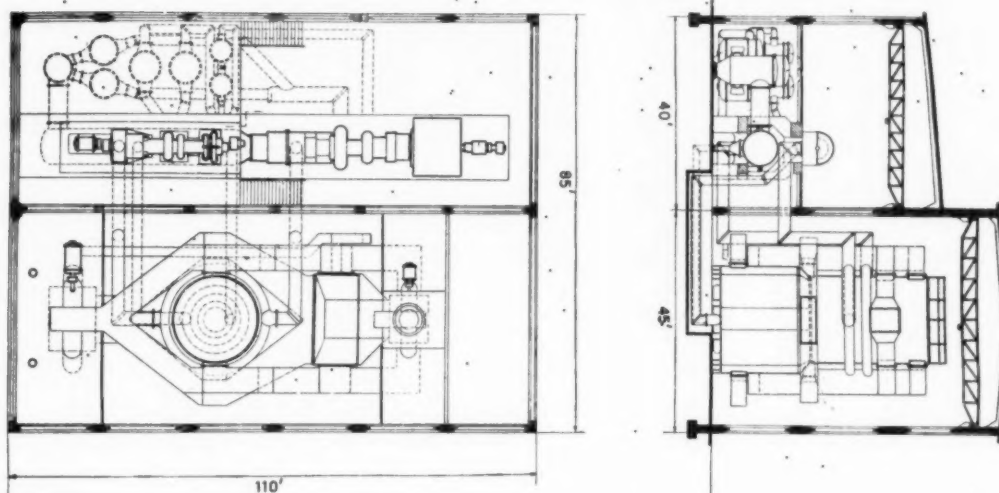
(a) PROPOSED LAYOUT FOR 12,000-KW COAL-FIRED PLANT
